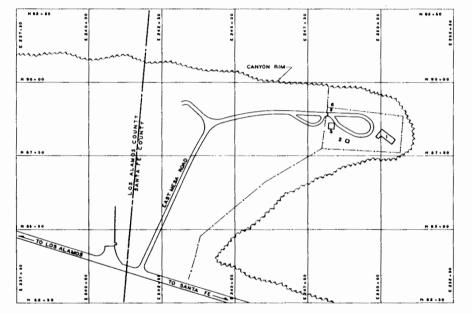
Structure Location Plan for TA-19 - East Gate Laboratory (1955). (1955 Drawing from the LANL Technical Area Structure Location Plans)
